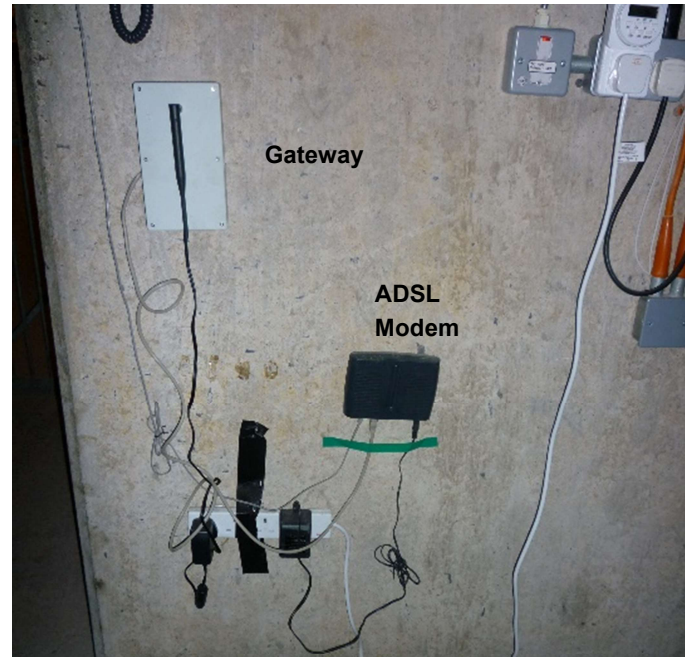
Original gateway and ADSL modem on the north wall of the east anchorage chamber Photo: Authors. (Photograph taken August 2009)
